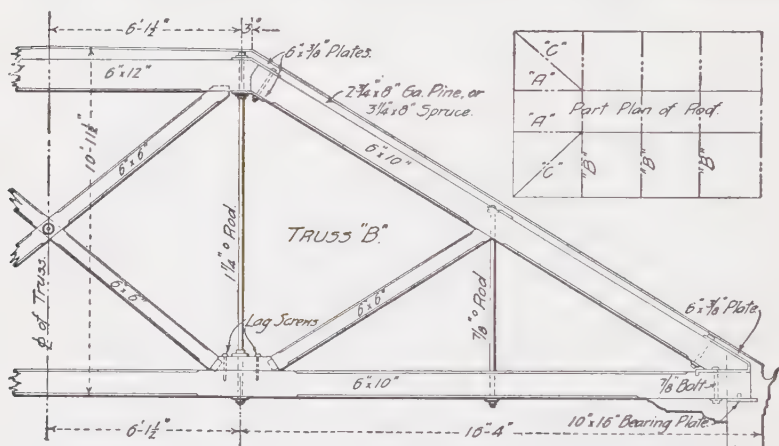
Roof Truss for Mess Hall and Kitchen of War College and Engineer Post, Washington, D. C.
